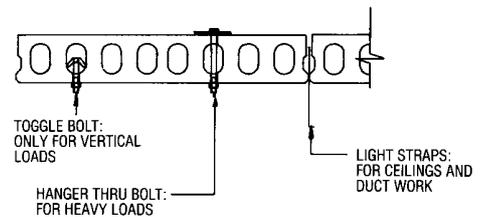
TYPICAL HANGER ARRANGEMENTS
